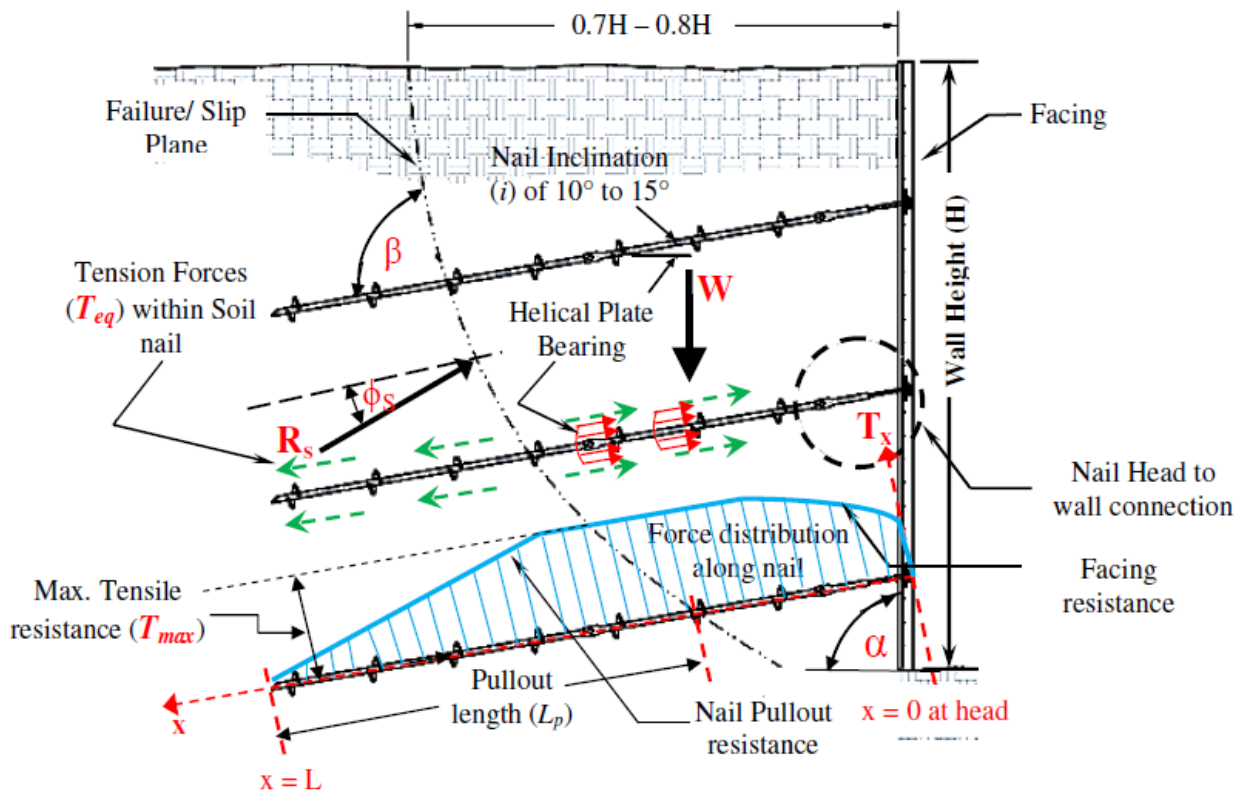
7 Various forces acting in a helical soil – nailed wall [8-9, 98]
